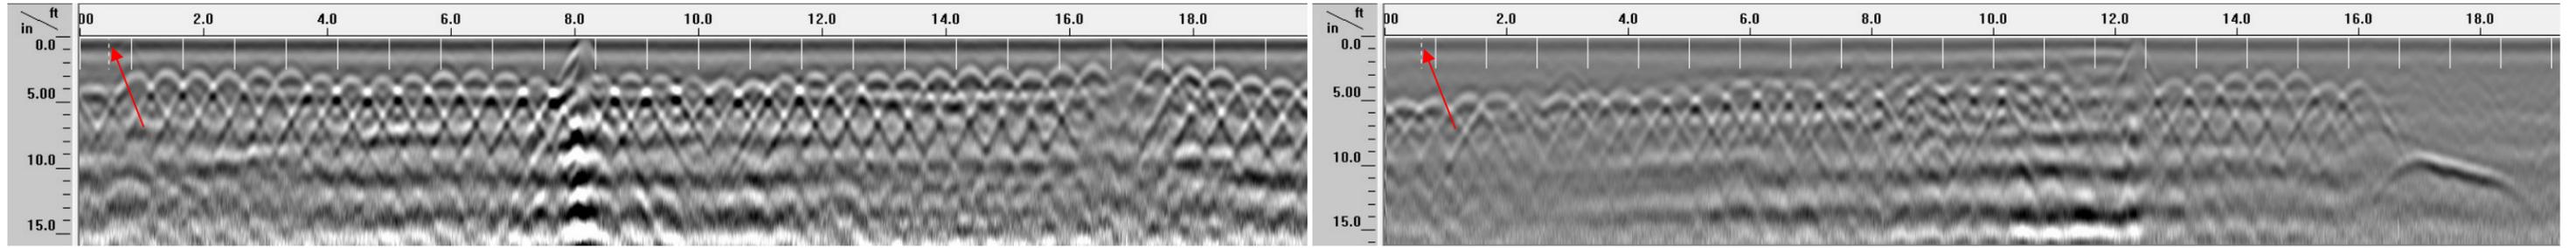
GPR profile F008.dzt along the side of the Wells Fargo Bank Building parallel to Shoshone from the curbline (red arrow). Similar to the figure 2 profile, the transvers rebar, bottom of slab and deck, and steel structural beams are shown. The beginning and end of the basement space is also clearly apparent (red vertical lines) and is roughly 140 feet long.
